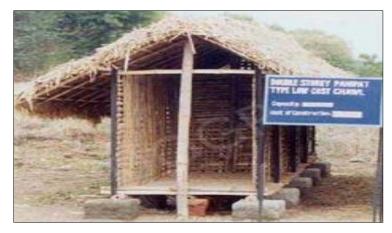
Bottom ventilated single row low-cost thatched roof storage structure
